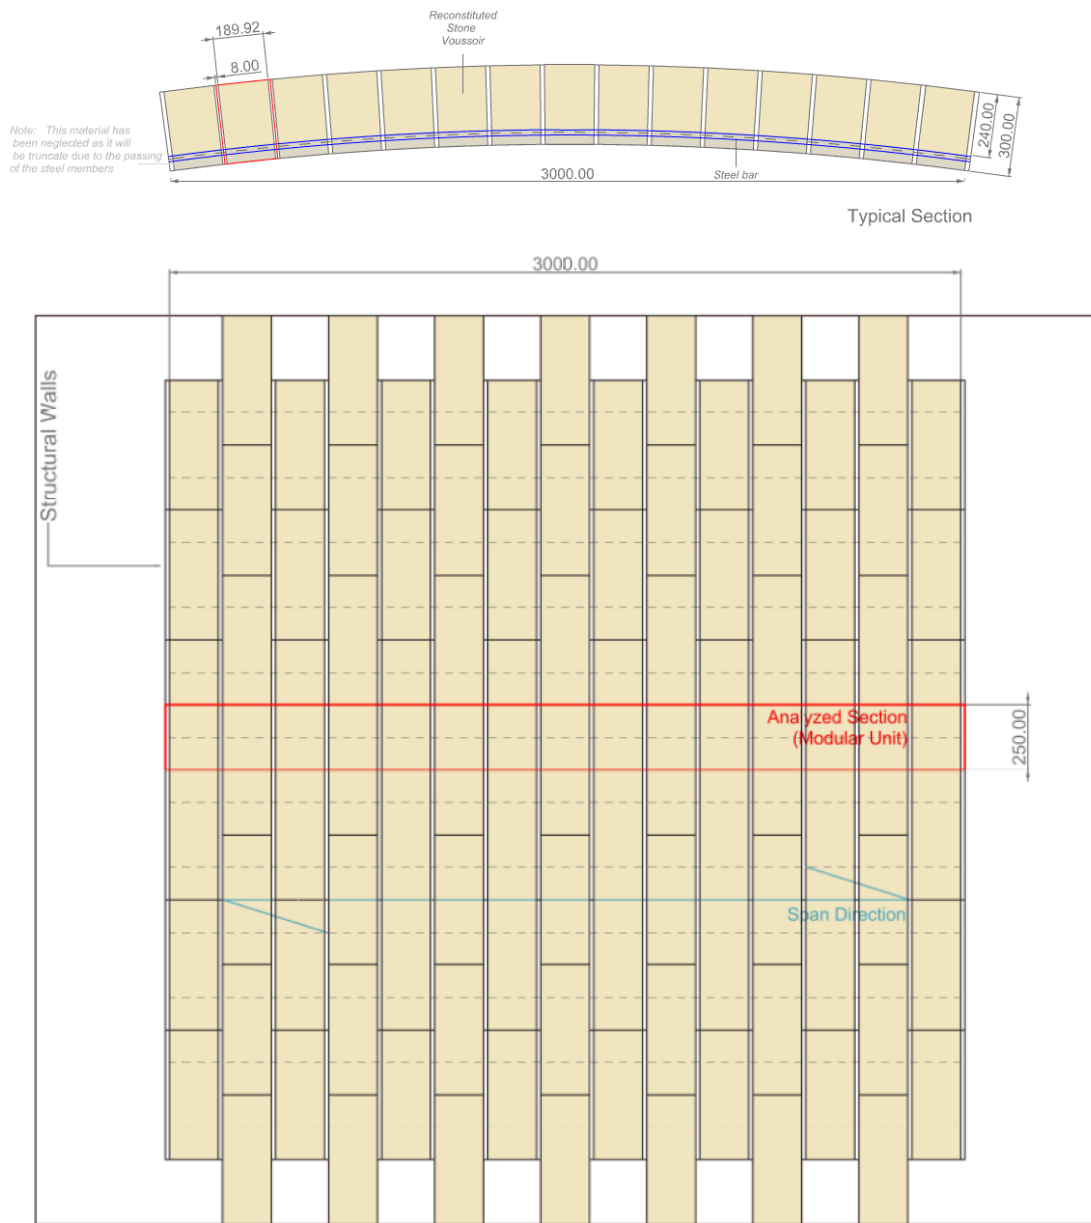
Section and Plan view of the vault and the typical analyzed segment
